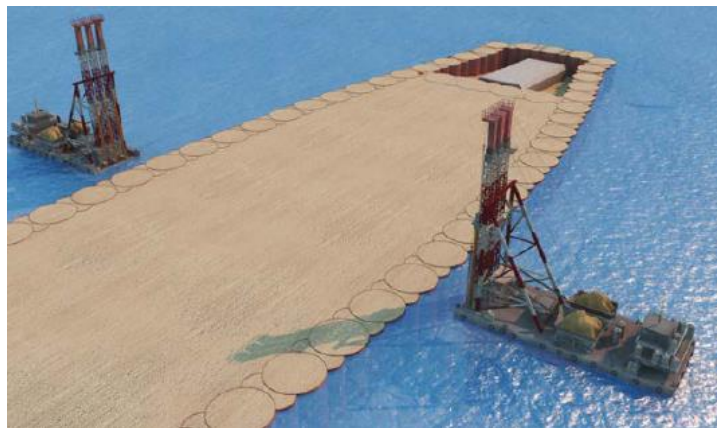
Construction of steel cylinder dike (after Yeung, 2016)
